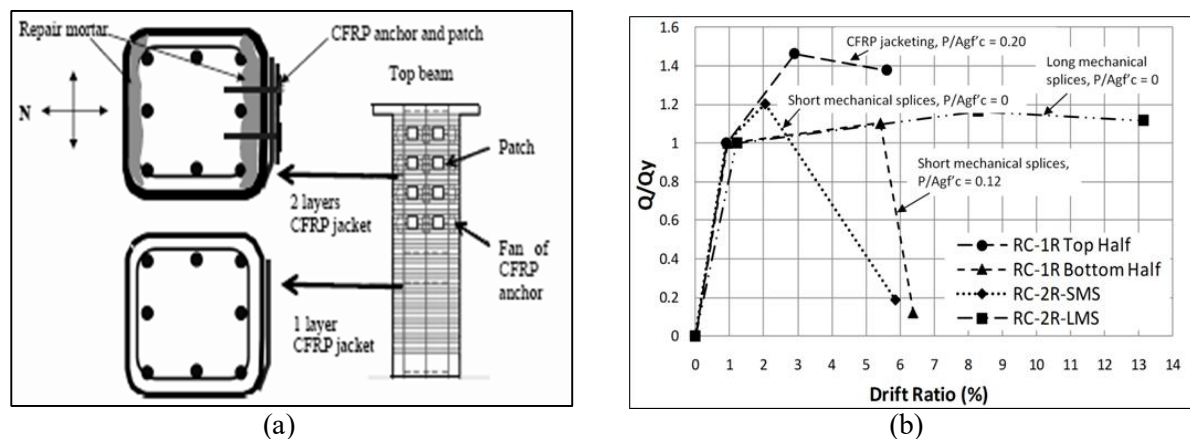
(a) Section of the Column Reinforced with CFRP Jackets with Anchors, units in inches [7]
